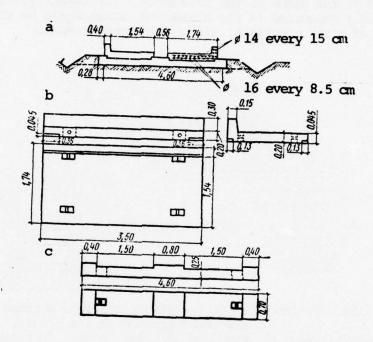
Construction of a prefab-reusable reinforced concrete surface under heavy loads.
